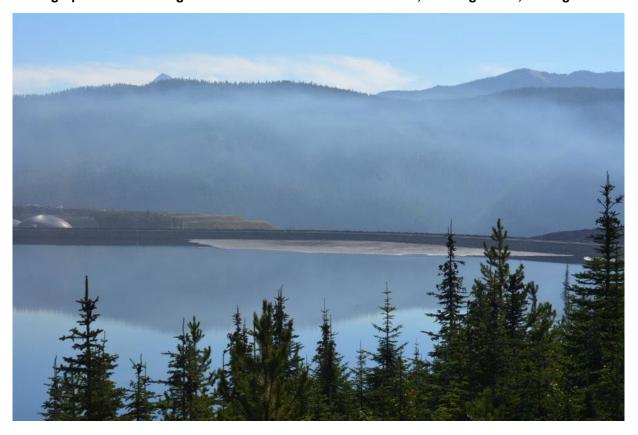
Main Tailings Dam - Overview, Looking Southwest, 30 August 2022
